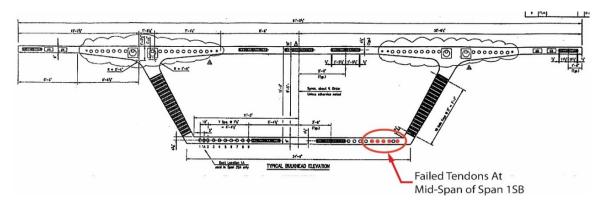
Typical Segment Bulkhead Showing Location of Failed Tendons
